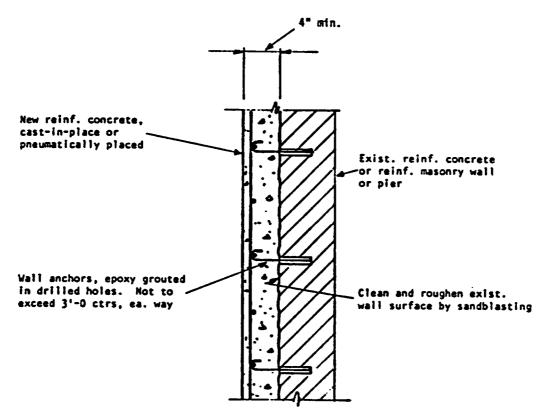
Strengthening of existing reinforced concrete or masonry walls or piers
